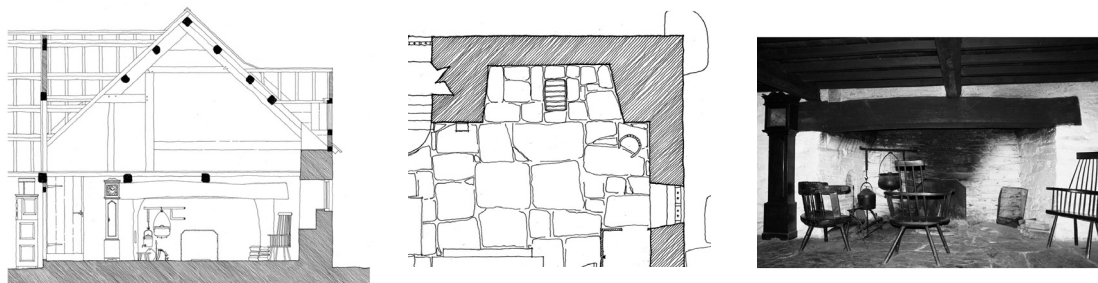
Sectional elevation of the main hearth at Cilewent longhouse, St Fagans showing the iron fire back; Fig. 7.69 Plan showing the hearth positioned against the wall; Fig. 7.70 Photograph illustrating how people gathered around the fire
